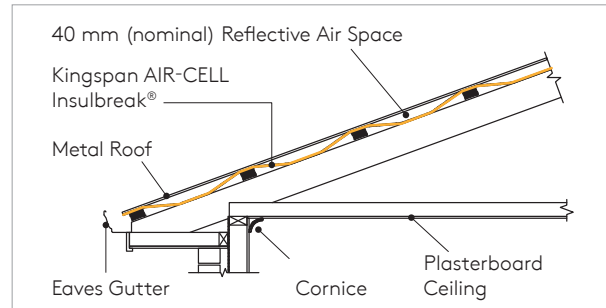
Side elevation of Kingspan AIR-CELL Insulbreak® 55 in a timber framed metal roof sheet, with an attic space and flat ceiling.
